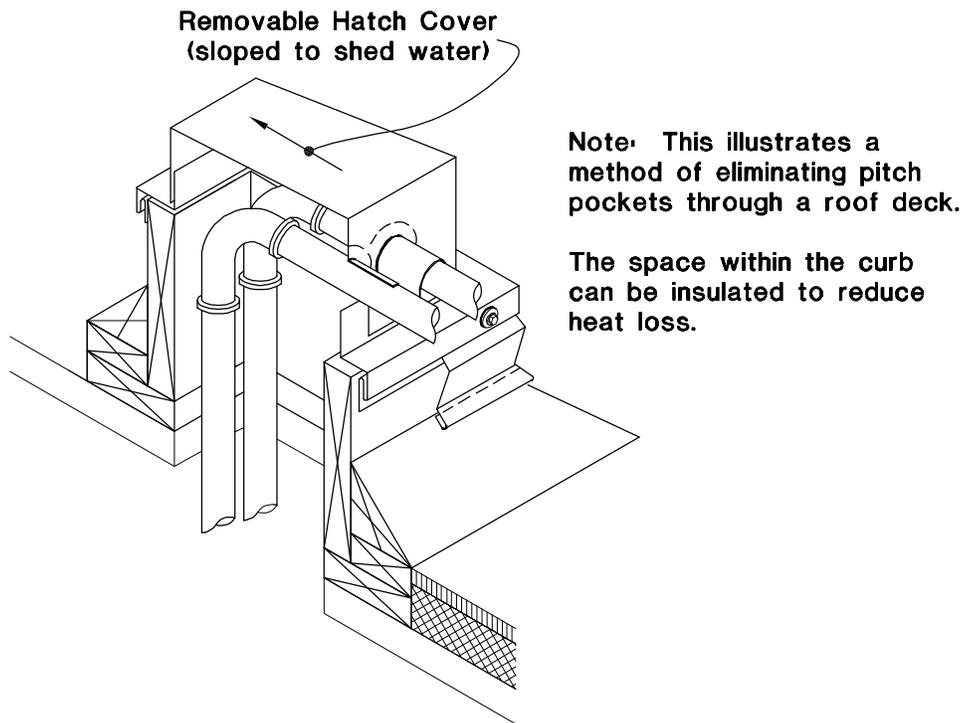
Curbed Enclosure for Piping Through Roof Deck
